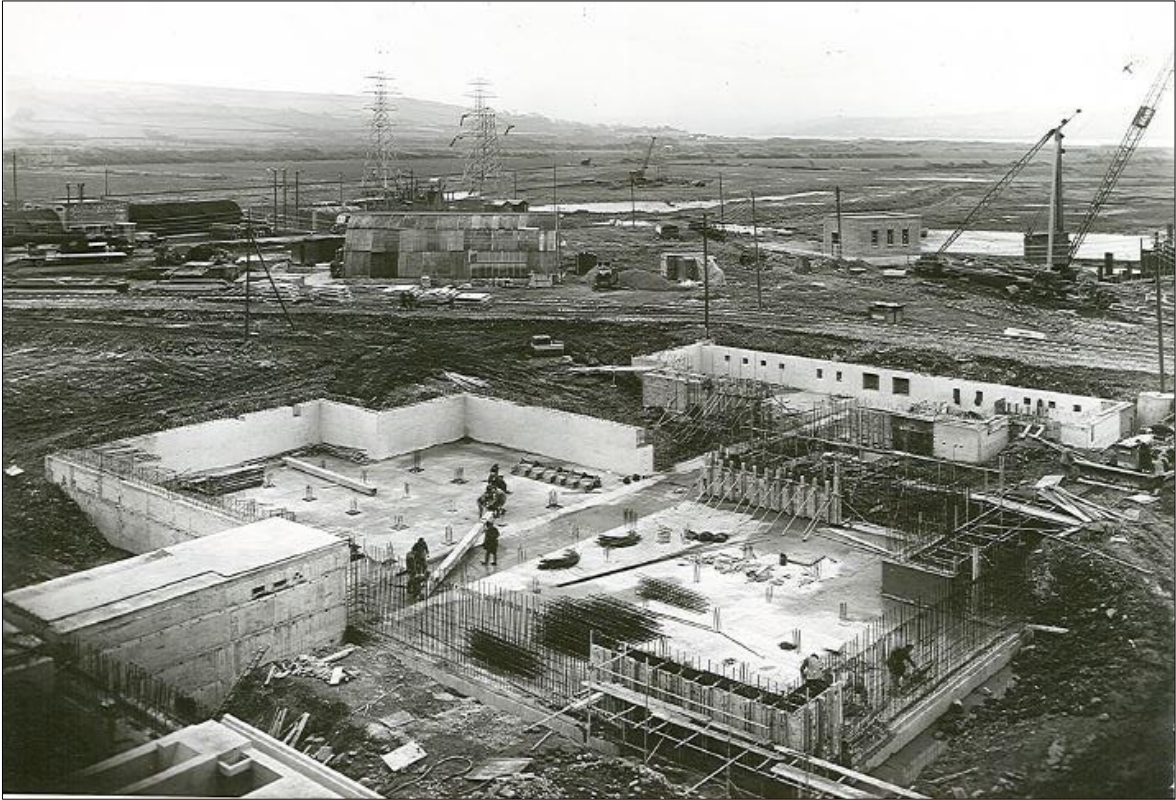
PHOTOGRAPH TAKEN DURING CONSTRUCTION SHOWING THE FOUNDATIONS OF THE CONTROL ROOM AND SWITCH-HOUSE BEHIND (SOURCE: PRIVATE COLLECTION).
